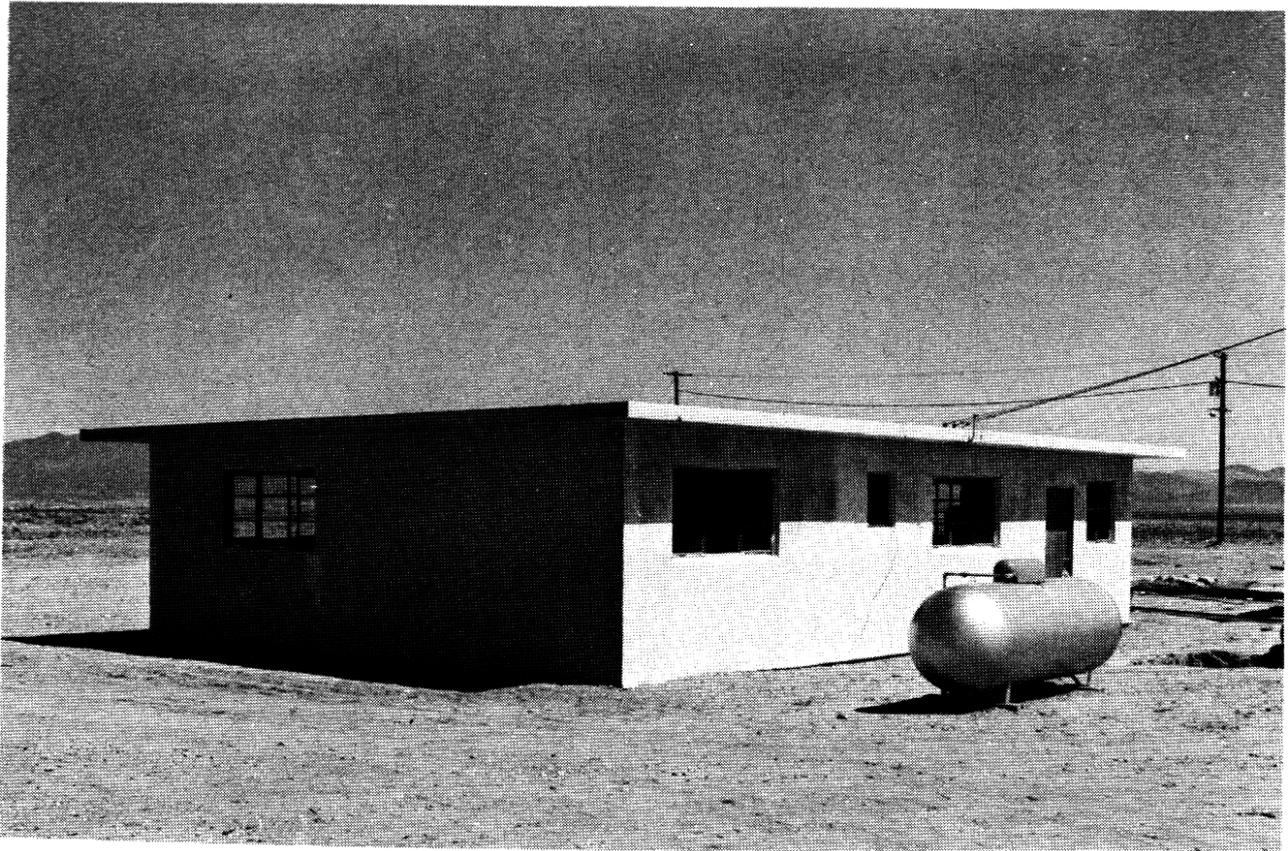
Reinforced precast concrete house before a nuclear explosion, Nevada Test Site.
